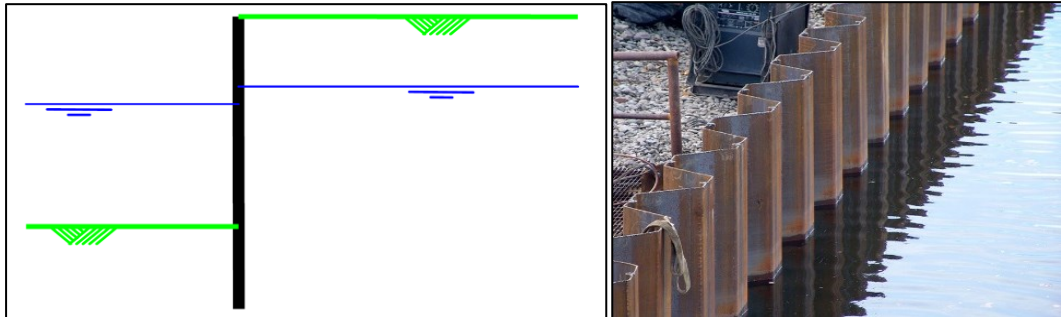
Example of Sheetpile wall (Meijer, E) (Gerdau)
